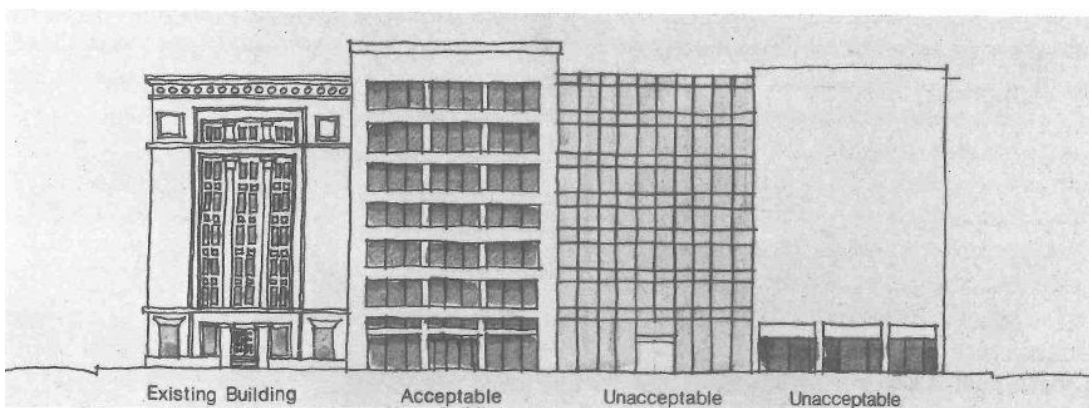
“Distribution of façade openings” (Lu 1980, 190).
